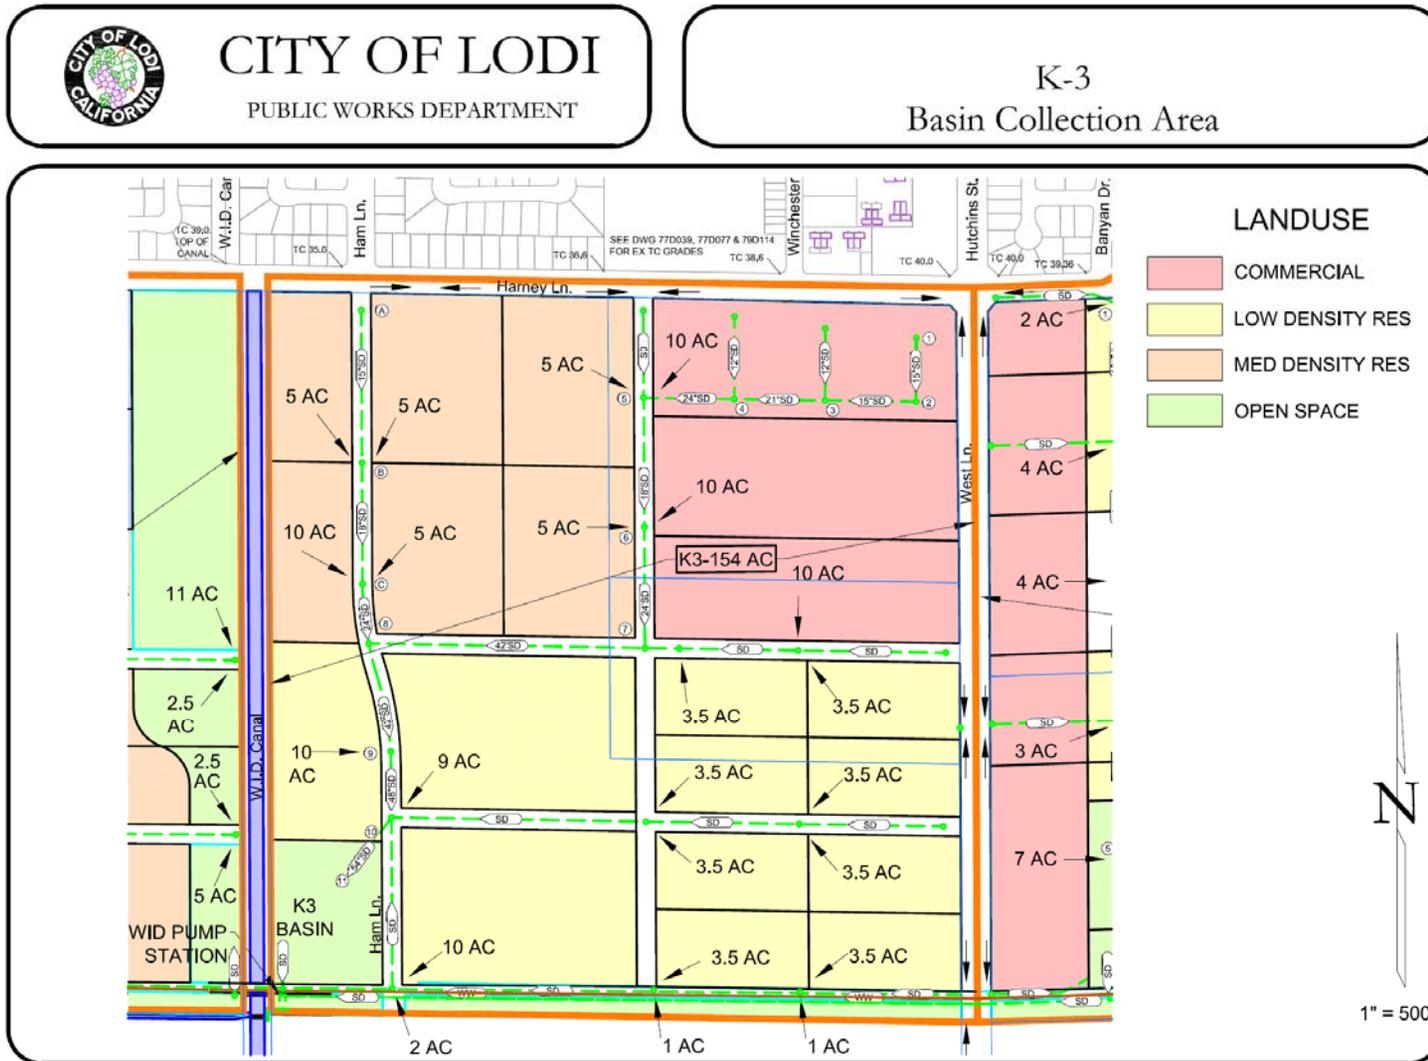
Proposed Conceptual Storm Drain Plan
